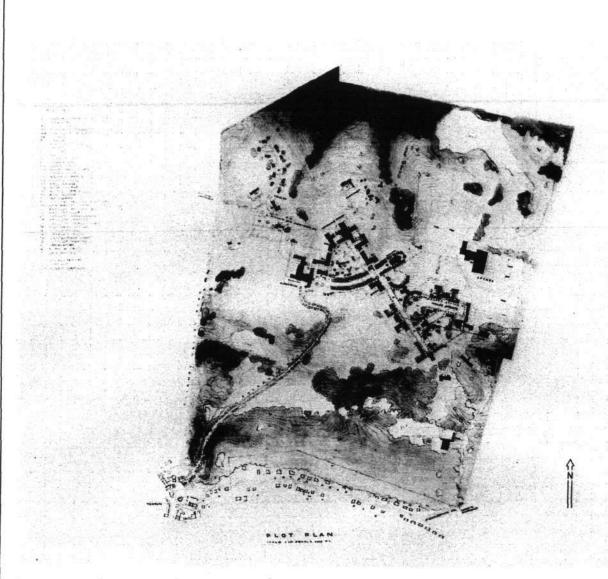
John C. B. Moore and Robert S. Hutchins, Campus Development Plan and Library, Goucher College, 1938. Campus plan. (Photo courtesy Goucher College.)
